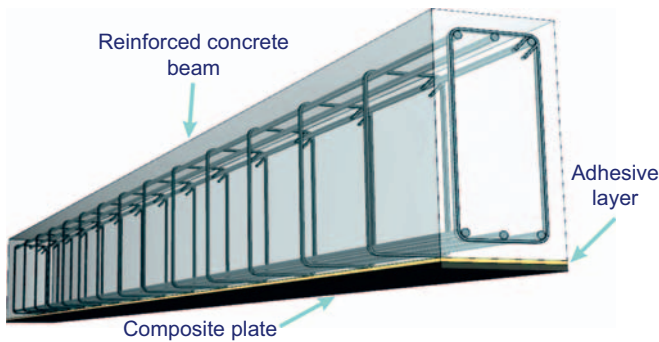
The plate bonding strengthening technique of reinforced concrete (RC) beams.
